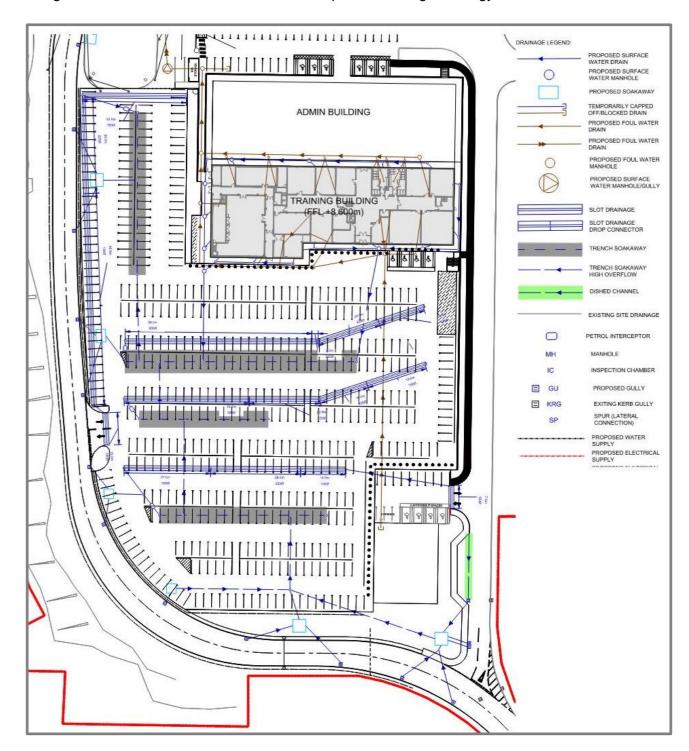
Car Park and Perimeter Road Proposed Drainage Strategy
